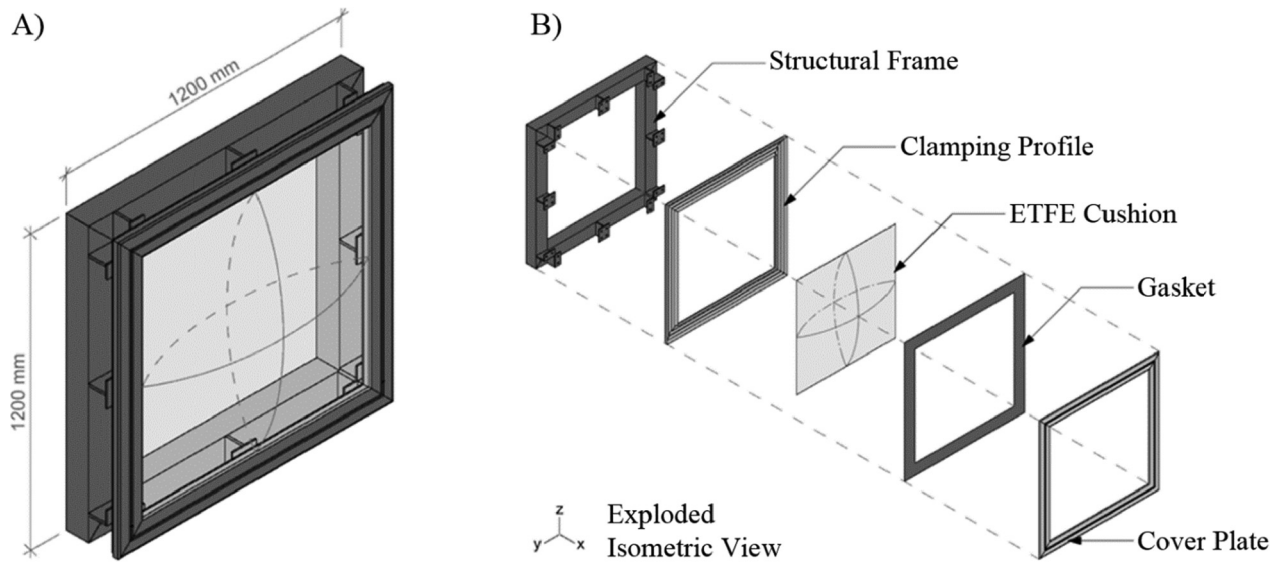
Isometric view of the test frame and ETFE cushion (A). Exploded view of the test frame showing main system components (B).
